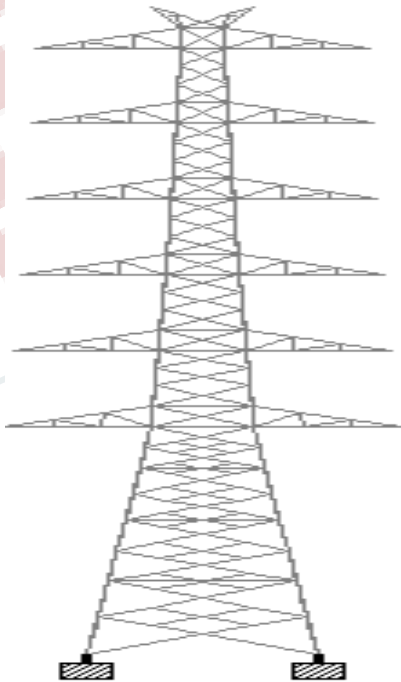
(a): Elevation of four legged tower in XBX bracing
